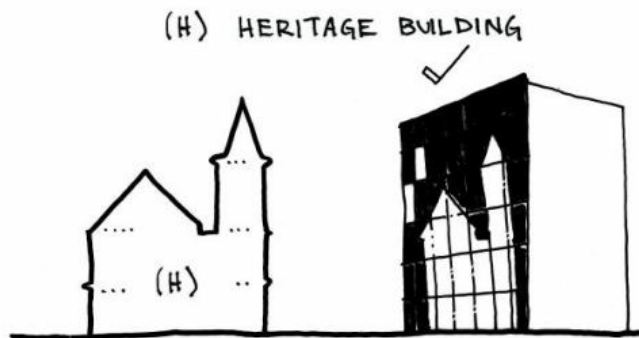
Illustrates an example of an appropriate outcome. The proposed new development adopts ridge and parapet lines of the heritage place and enhances the continuity of the streetscape
